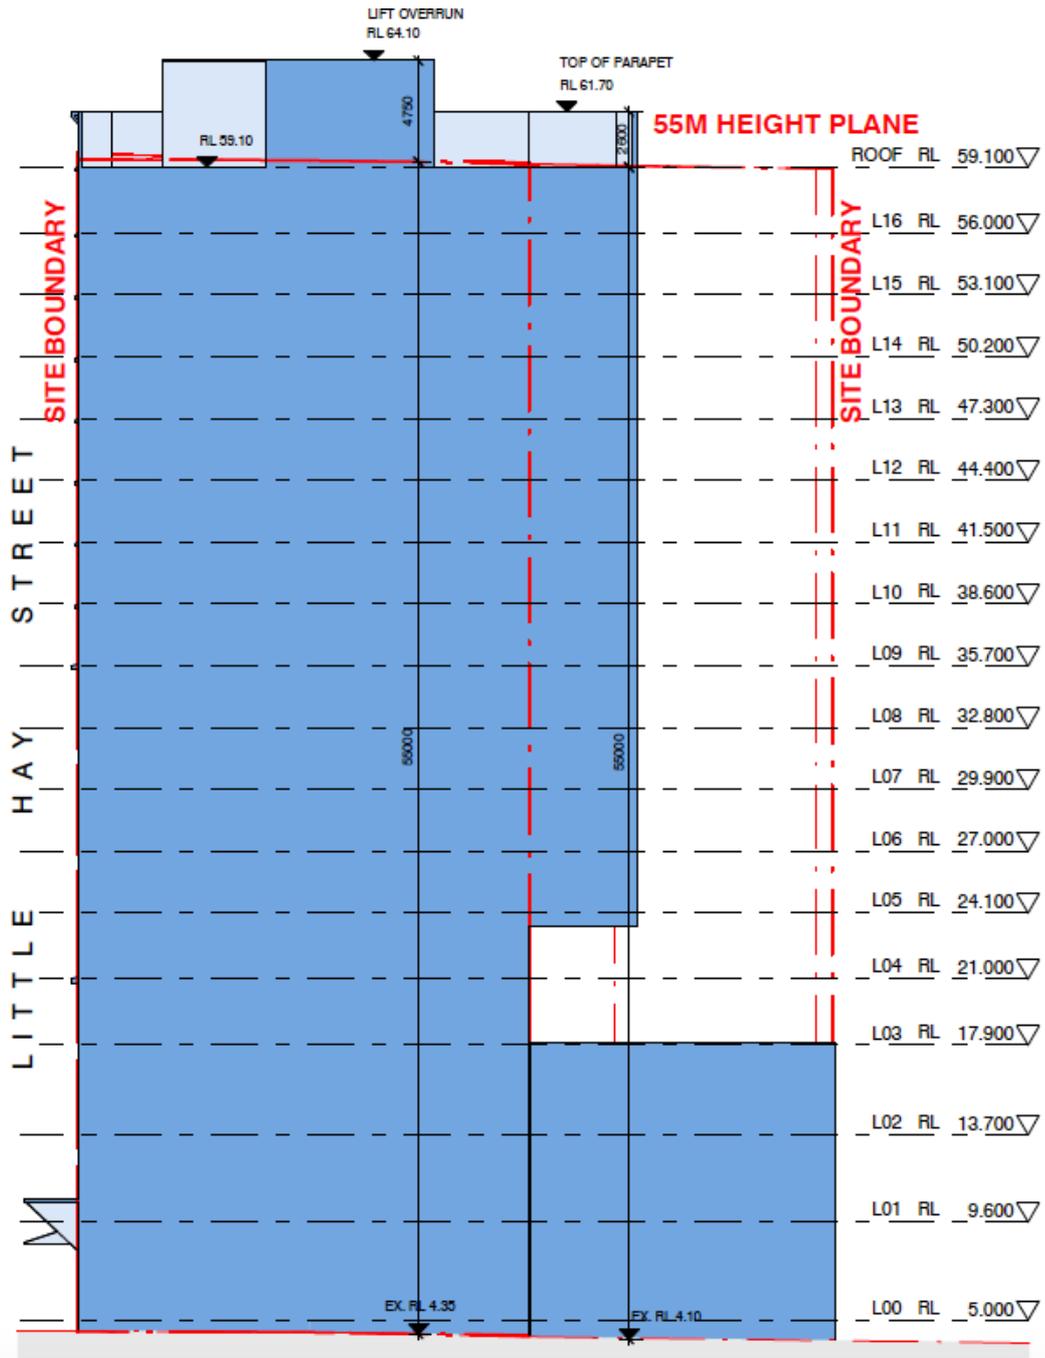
Enlarged Section Plan (55m height limit) – No GFA Above
